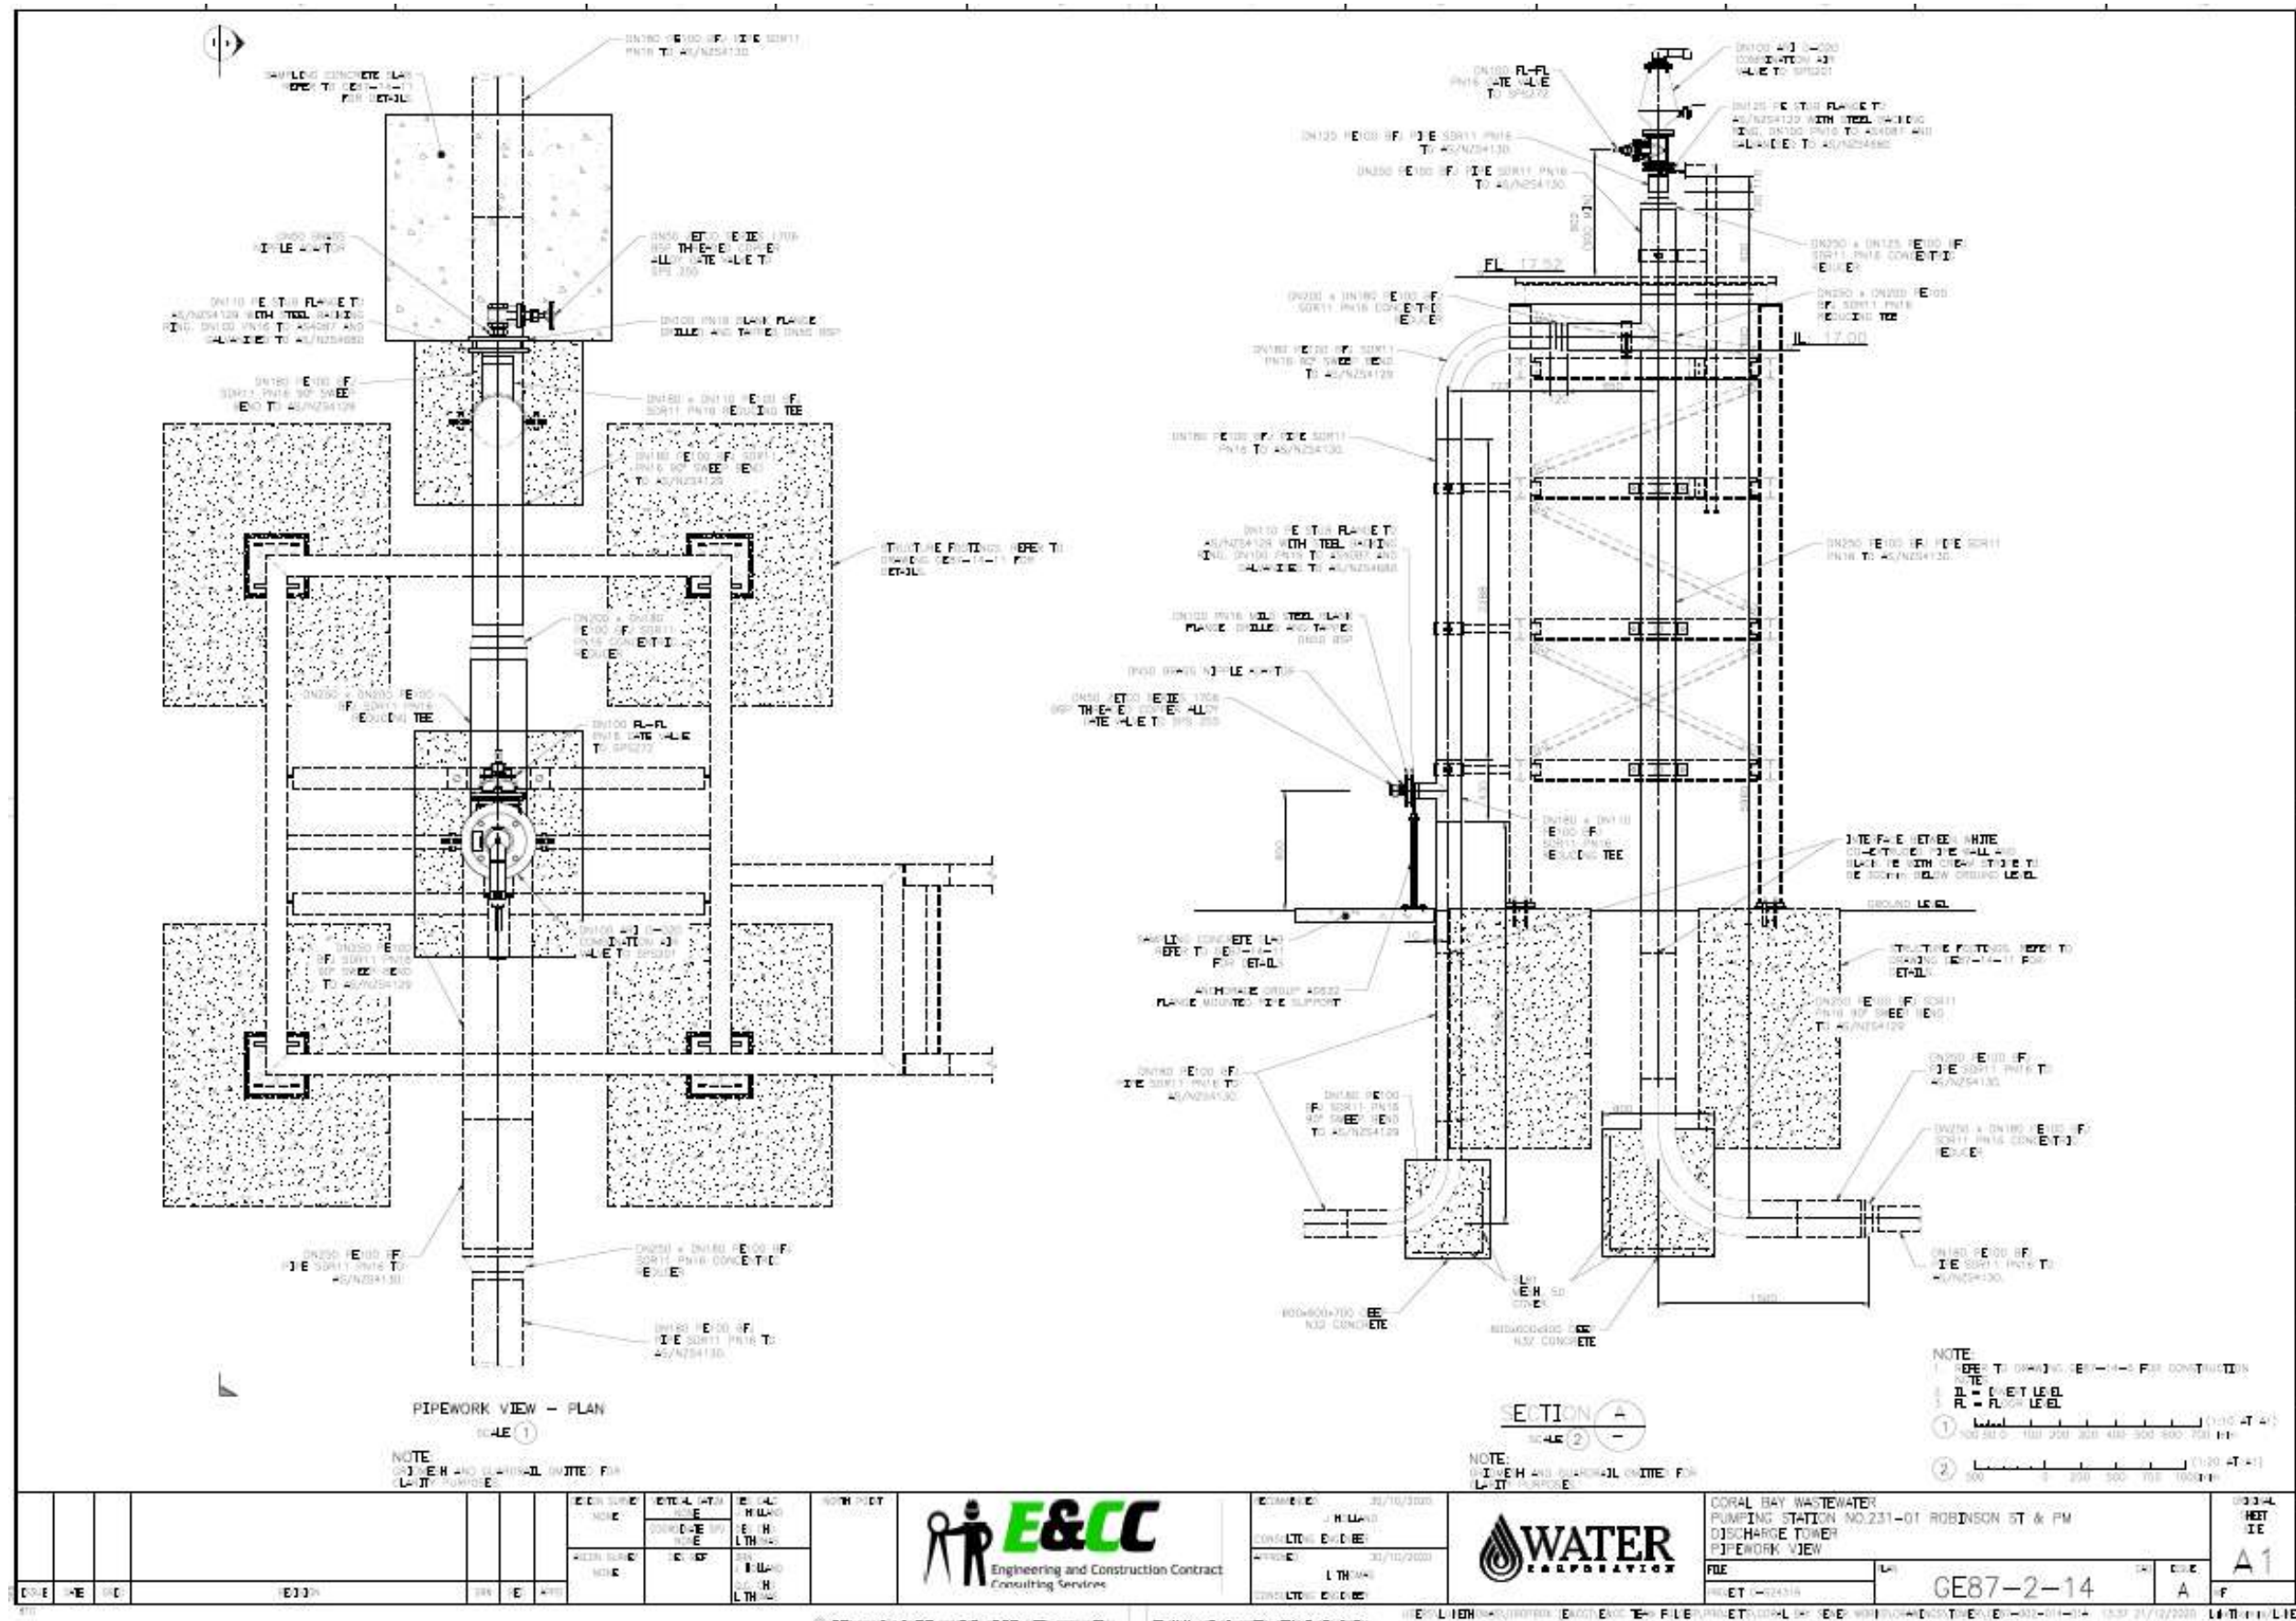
Coral Bay Wastewater Treatment Plant discharge tower installation – plan GE87-2-14
